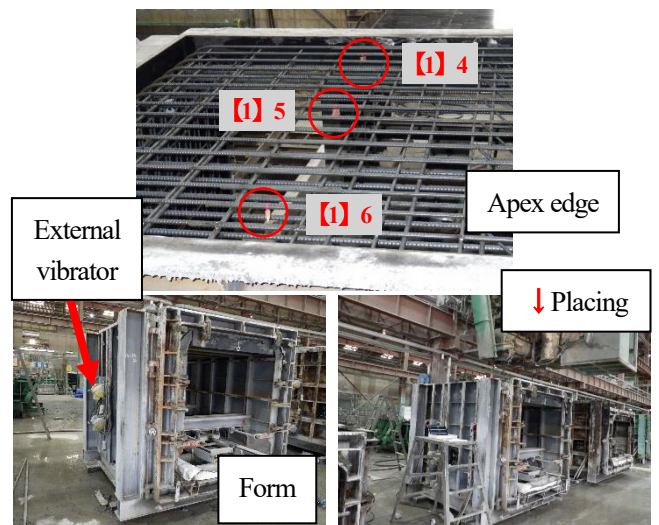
Installation of rfid tag, form and placing of concrete (box culvert)
